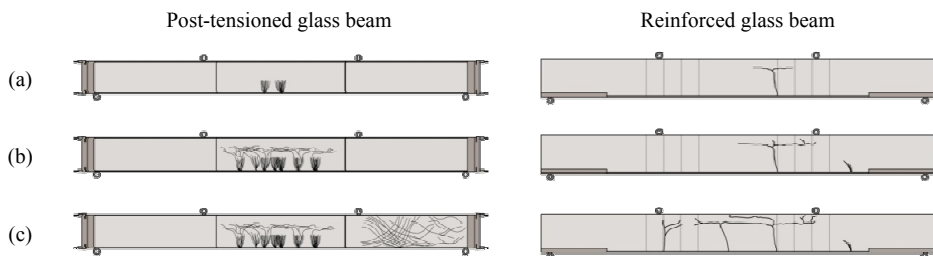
crack development in a post-tensioned glass beam and a reinforced glass beam [Louter & Veer, 2007b].
